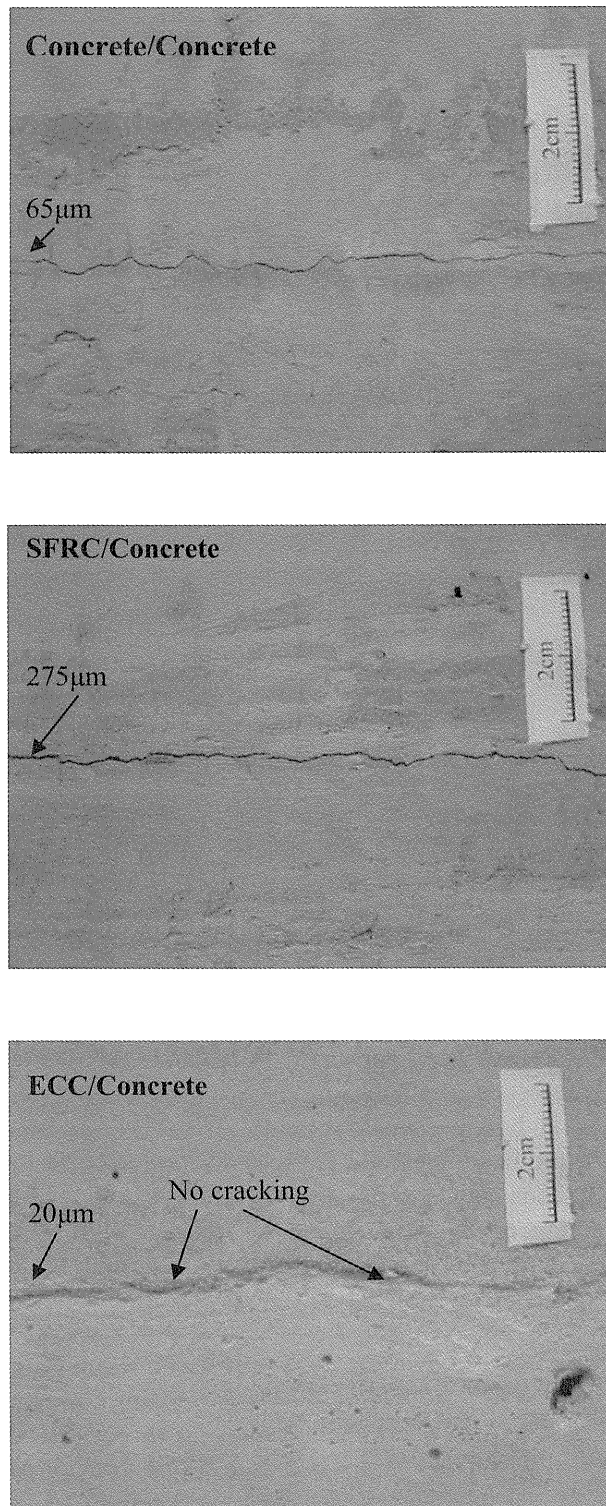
Interface delamination and delamination height of layered repair systems based on concrete, SFRC and ECC (concrete substrate surfaces roughened to 7~8mm)
